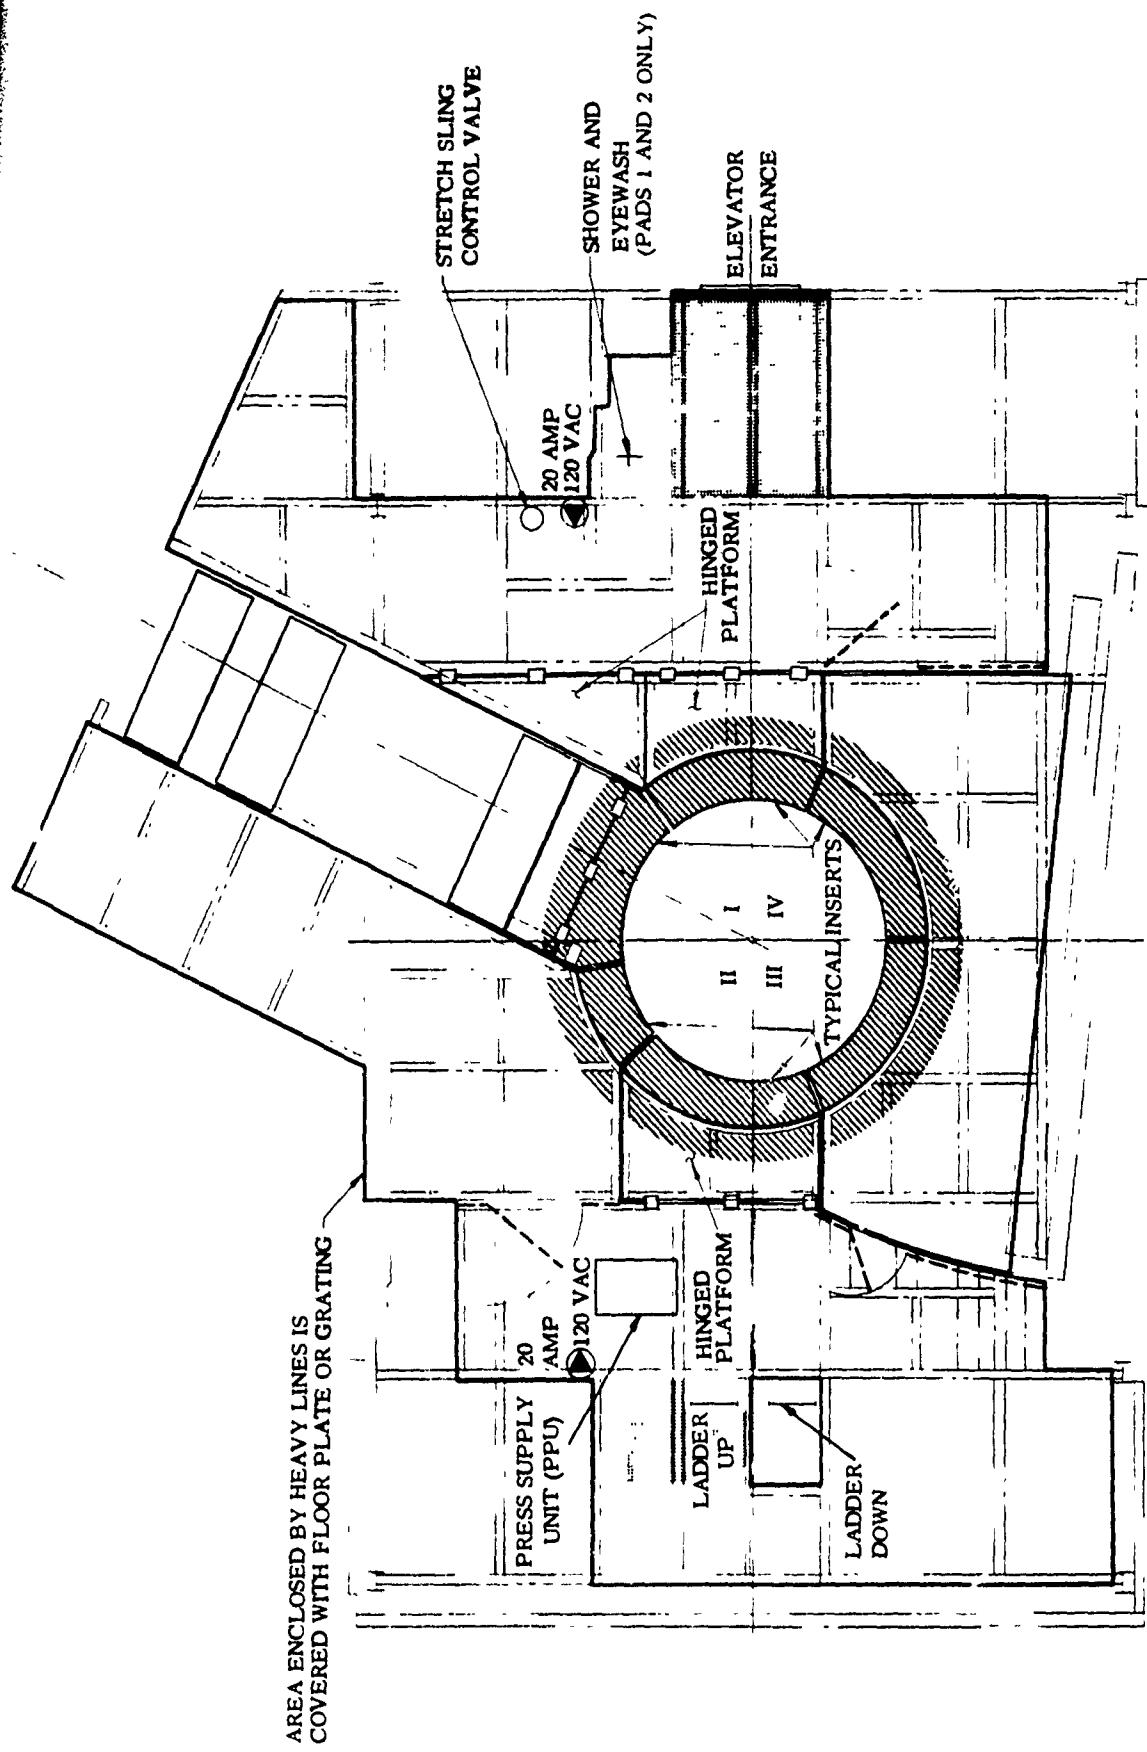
Usable Floor Space Areas, Tower Station 75
